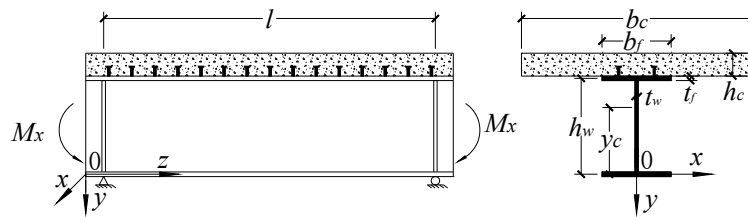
Cross-sectional dimensions of I-steel concrete composite beams
